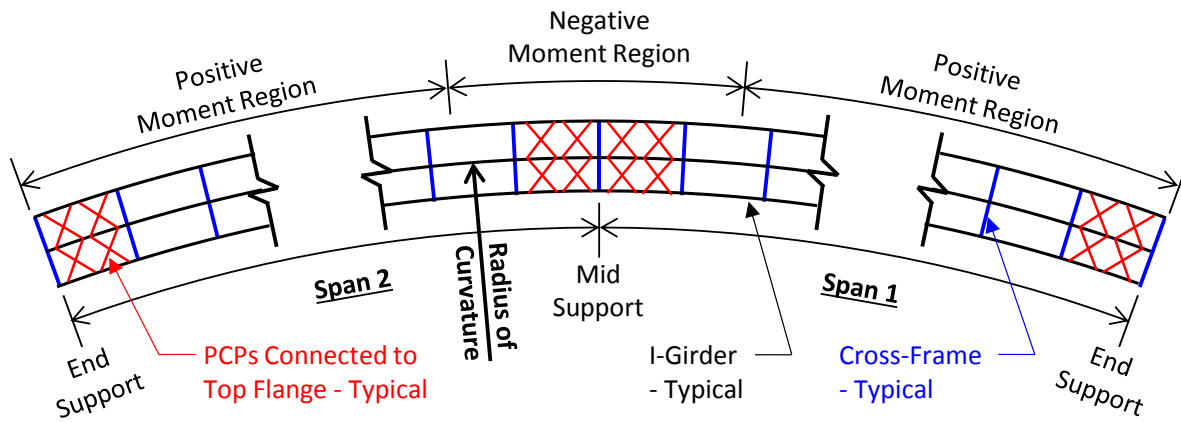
I-Girder Layout for Parametric Study – Plan View
